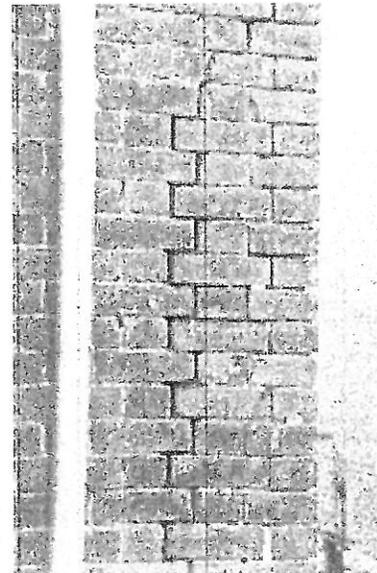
The new half-round downspout shown above was installed well after the lack of proper drainage had caused failure in the corner of this historic brick building. Proper guttering and water diversion systems should be well-maintained throughout the historic district.
